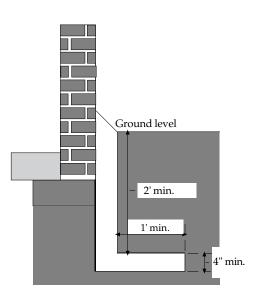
A 1-foot horizontal footing extension to deflect burrowing rodents.
